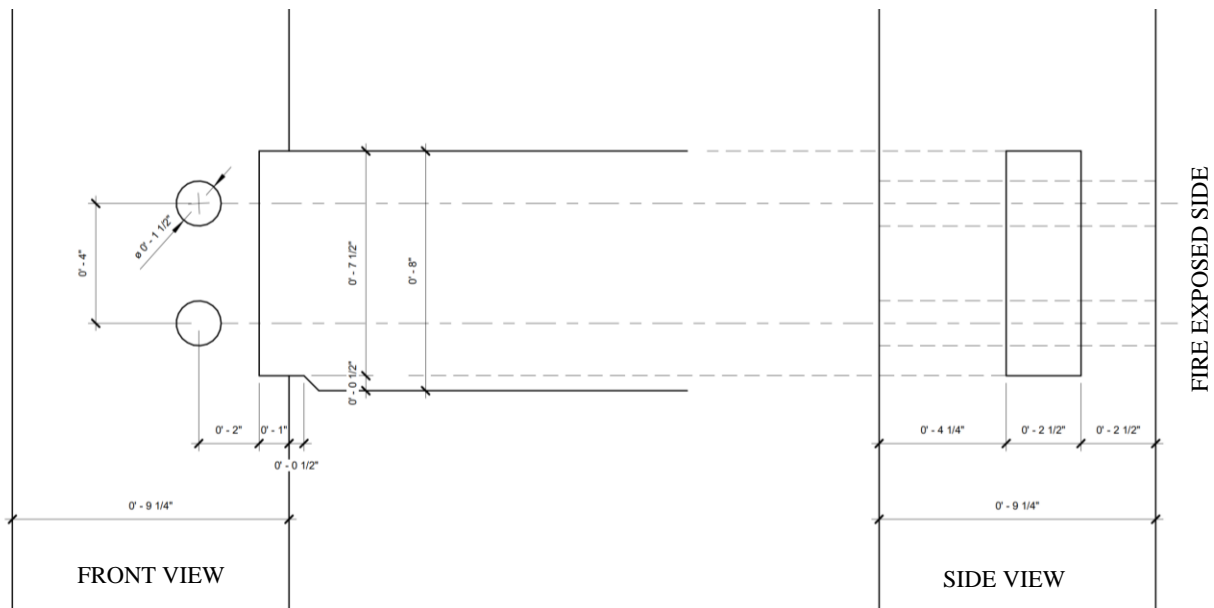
Dimensions of fully housed mortise and tenon heritage connection being tested
